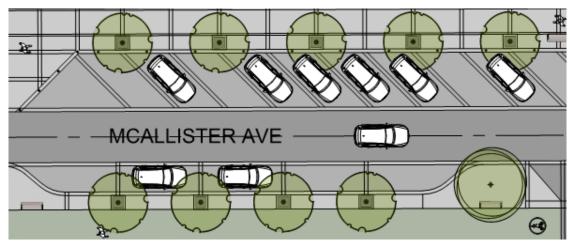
Typical layout of travel lane (Eastbound), MUP and parallel on South Side and Angled Parking on North Side
